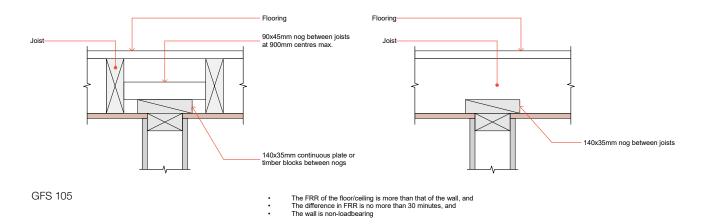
Direct fixed ceiling lining to timber joists (Section view) - Option 2
